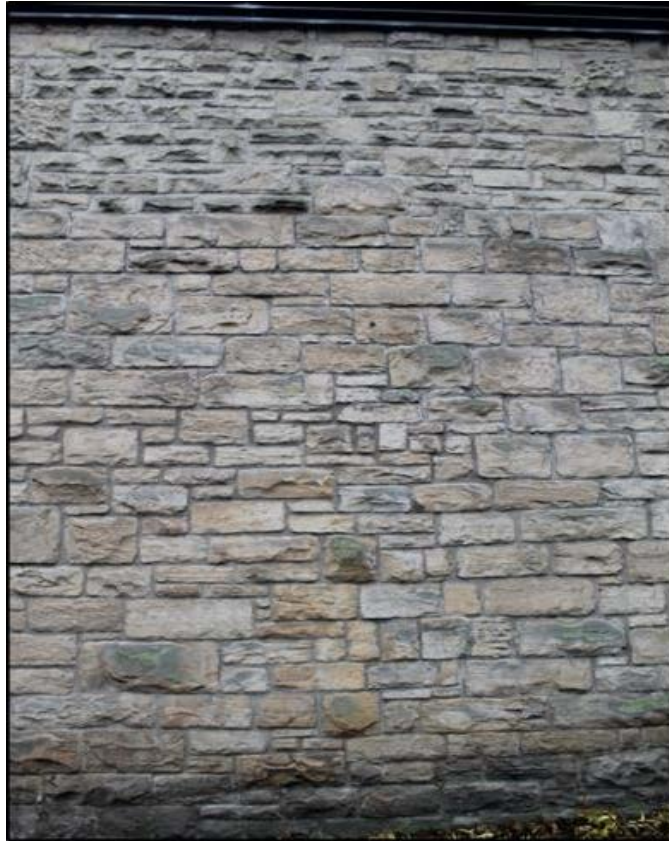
Showing historic stonework (lower courses) and modern stonework (upper courses) on the north elevation of garage/office building
